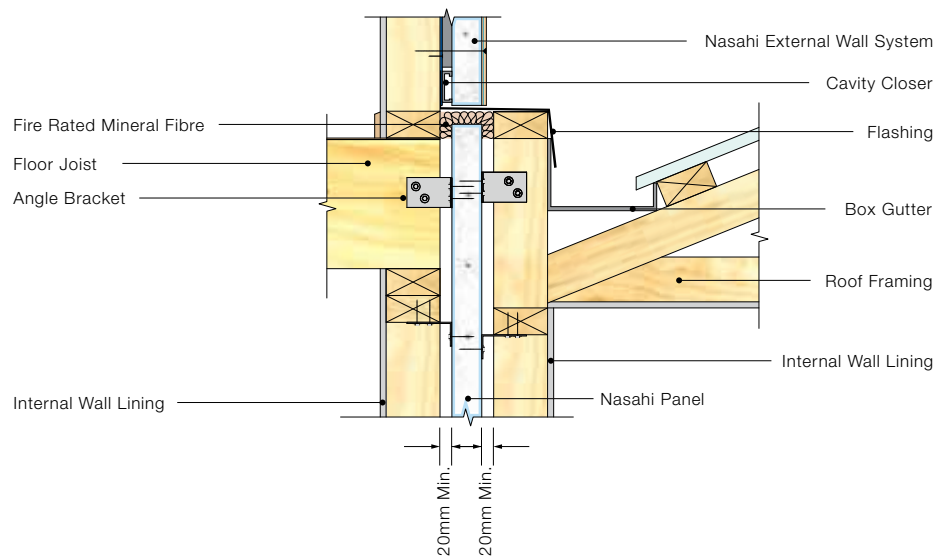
TYPICAL PARTY WALL CORNER
